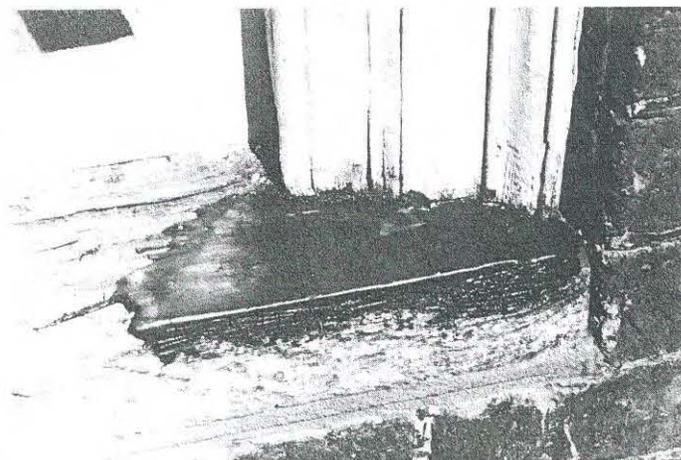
This illustrates a two-part epoxy patching compound used to fill the surface of a weathered sill and rebuild the missing edge. When the epoxy cures, it can be sanded smooth and painted to achieve a durable and waterproof repair. Photo: John H. Myers
